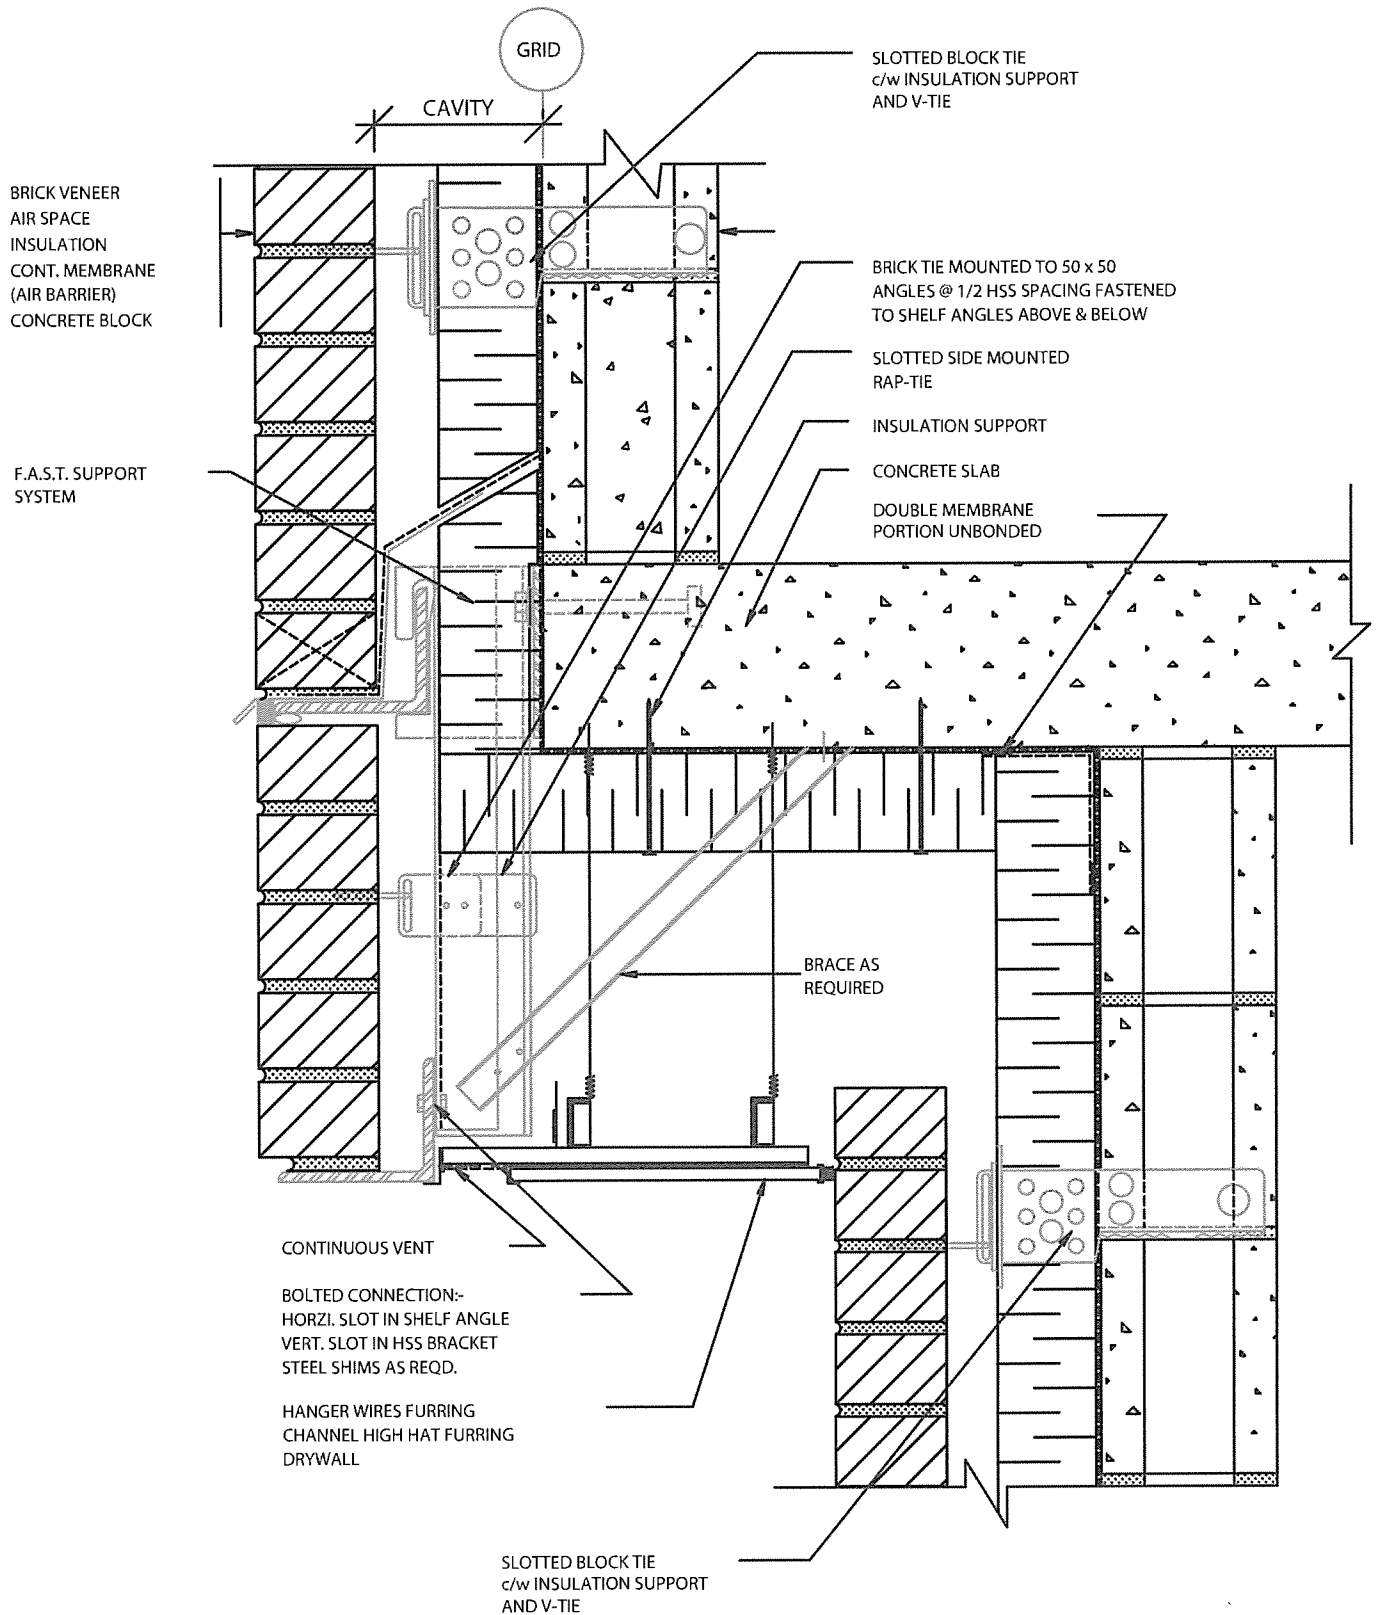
BRICK VENEER/CONCRETE BLOCK-COLD SOFFIT DETAIL
